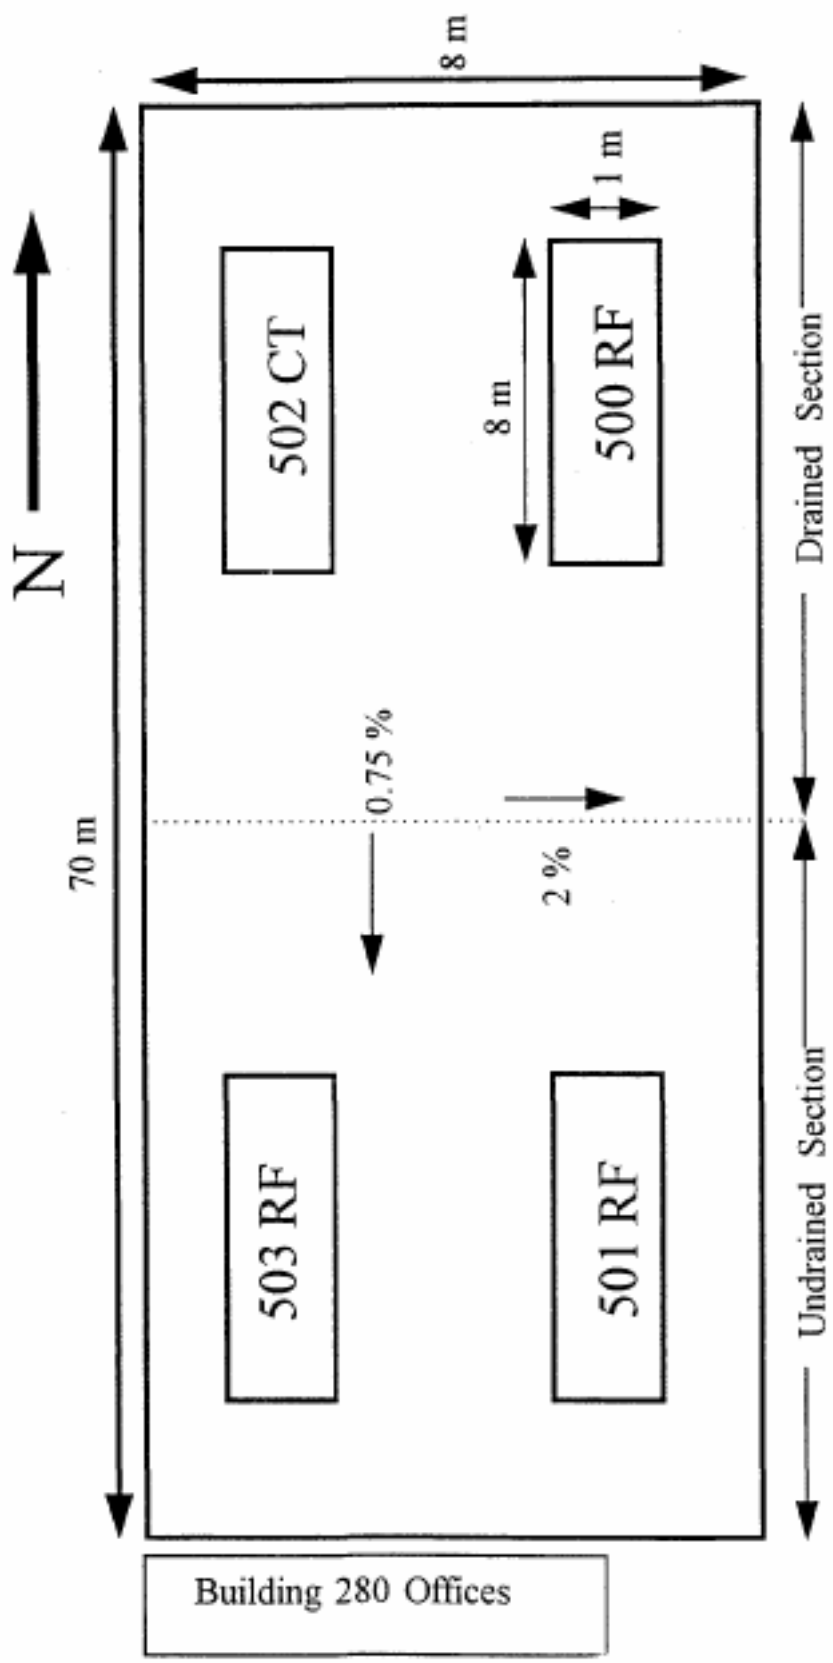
Test Pavement at Richmond Field Station with Test Sections
